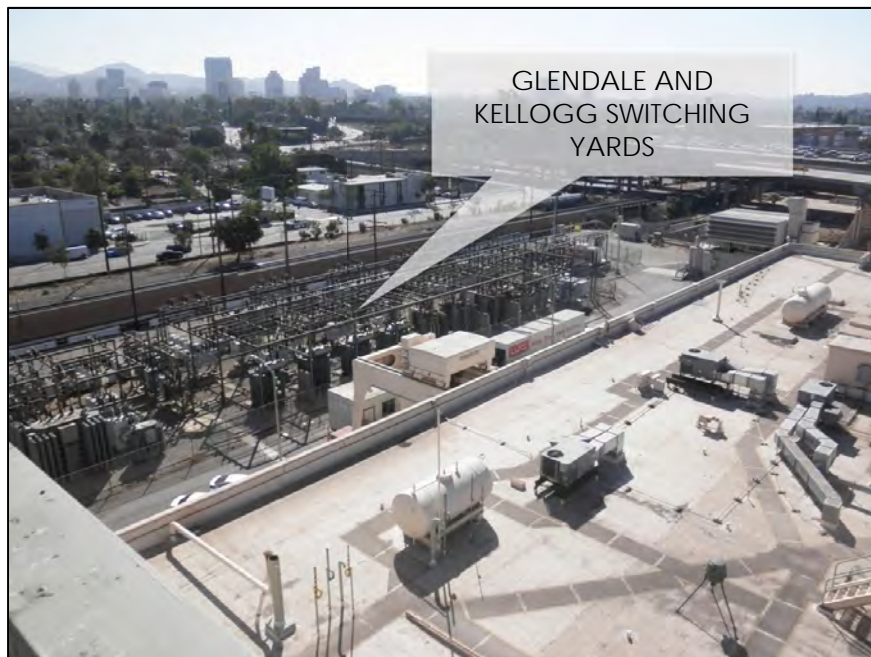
Overview of Project Area from Roof of Grayson Boiler Building Looking Southeast at switching yards
